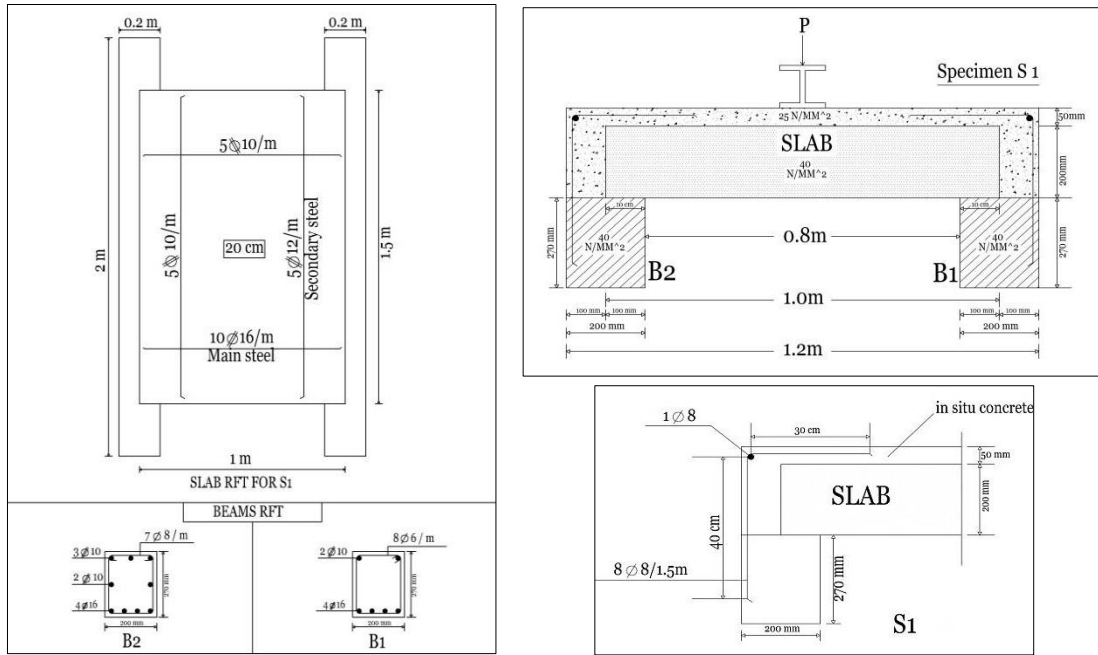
Steel Reinforcement Details of beams and slab of tested specimen
